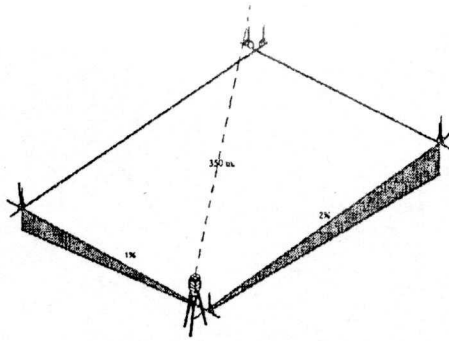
Example of pavement with two slopes to be levelled with the laser system.
